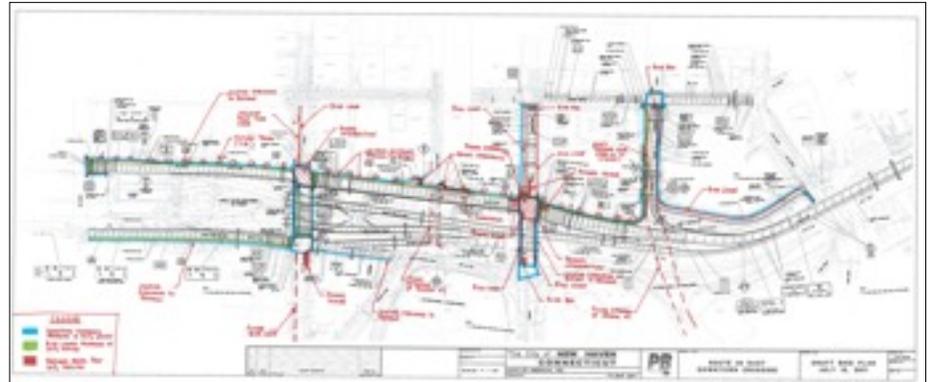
City of New Haven Revised plan, July 2011, showing extended bike lanes, raised tables at two intersections, and two bump-outs. The lanes have been reduced in width, but not in number, and no cross streets have been added.
